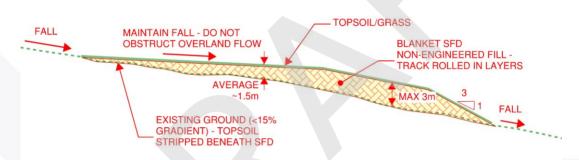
Blanket Type Surplus Fill Disposal Site – Typical Section
